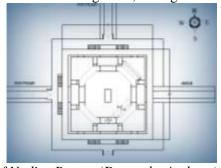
Layout Plan of Tomb of Nadira Begum (Drawn by Authors)
